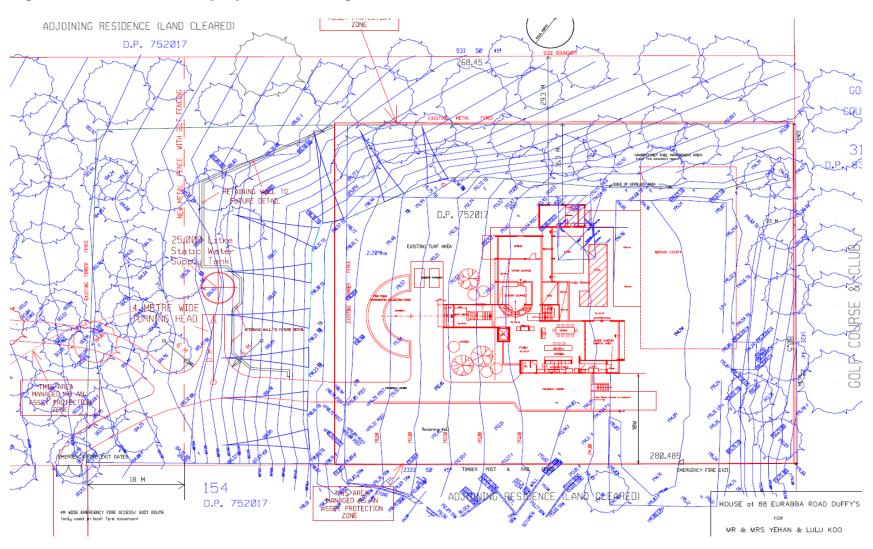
Site Plan of the proposed Dwelling Precinct.
